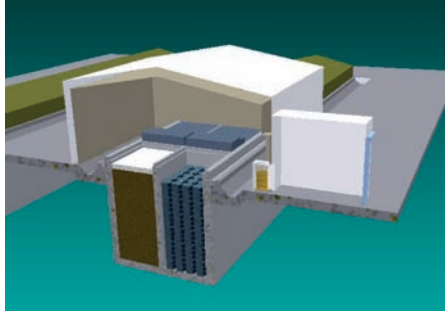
Section through a vault showing the proposed waste posting route.
